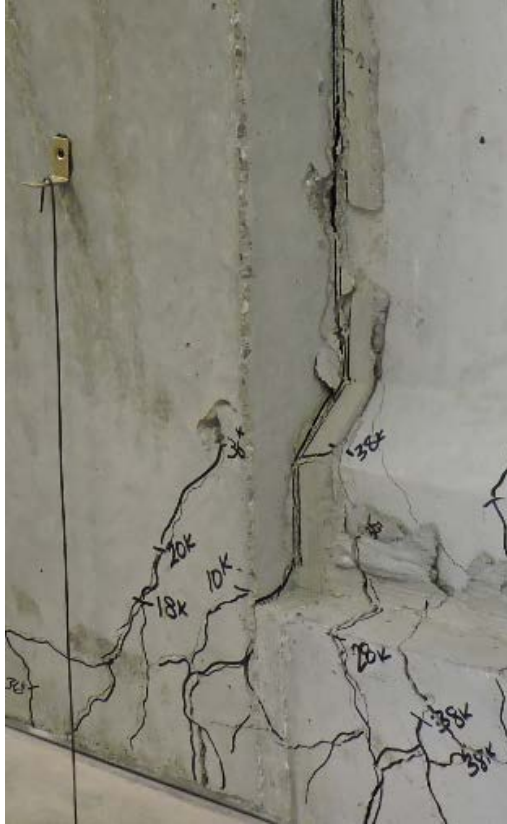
C2 Cracking at Girder-Joint Interface (Right Side)
